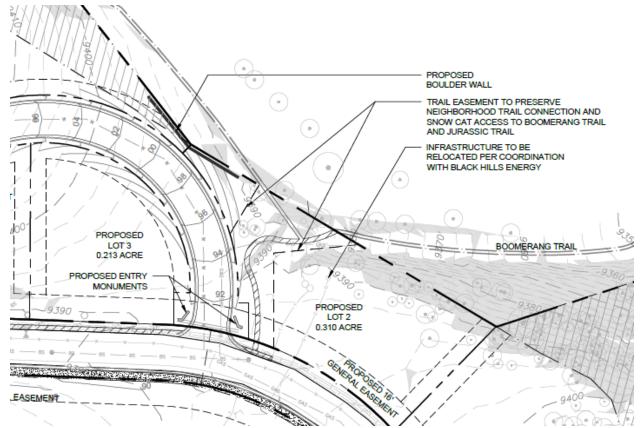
Image showing proposed easement and trail connection to Jurassic and Boomerang trails.
